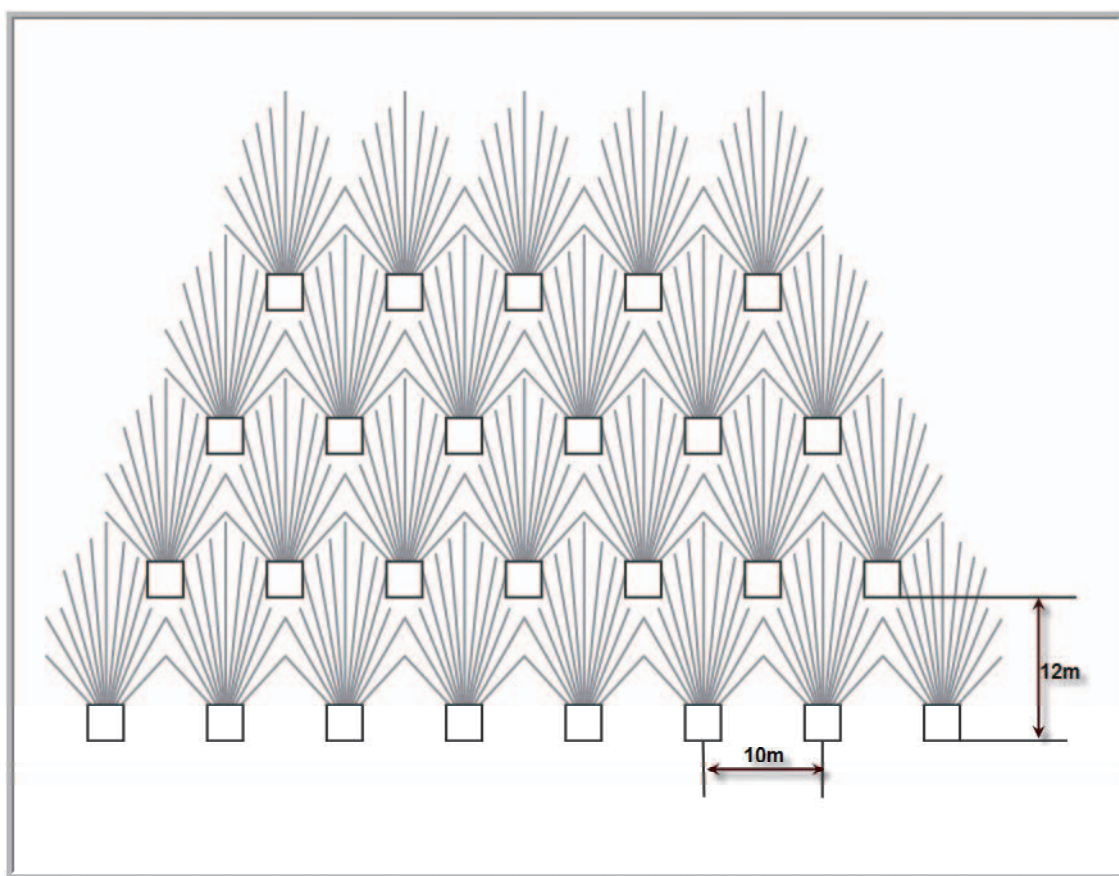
Low Grade Ore — Sublevel Cave Conceptual Layout (Long Section)
